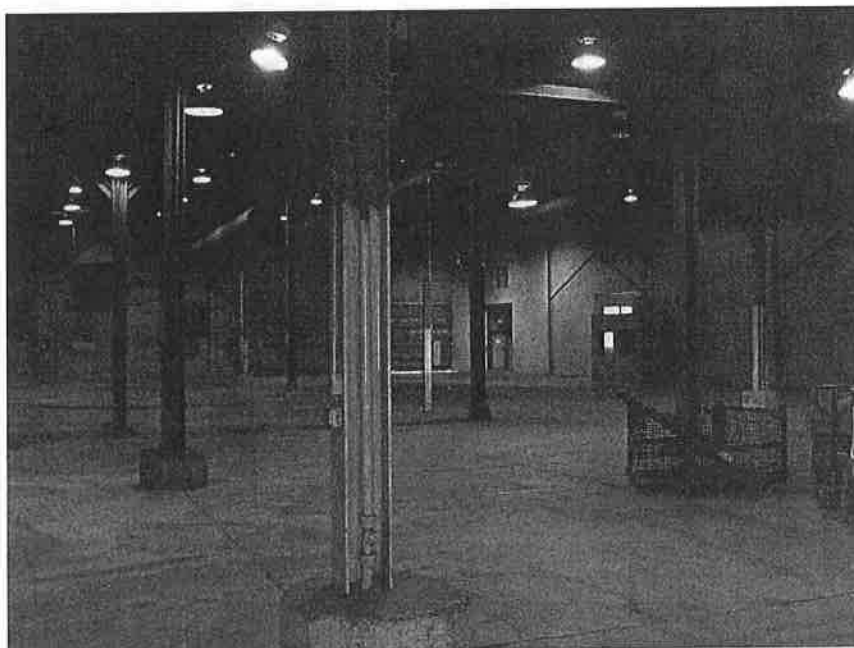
Typical building slab. View to east; photograph taken on March 5, 2015.
